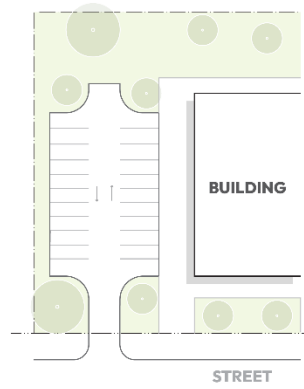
Permitted Parking Area Location - Between Building and Side Lot Line
